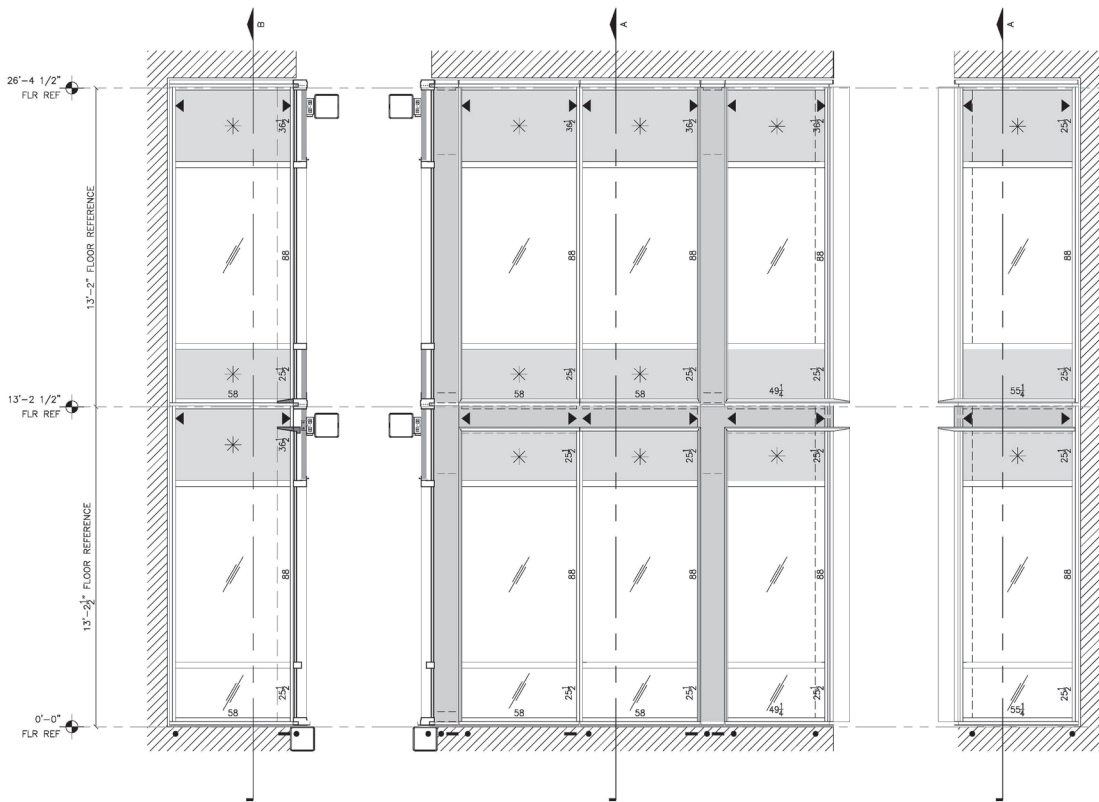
A – Mock-up elevation for a Class-A office building in The Woodlands, Texas.
